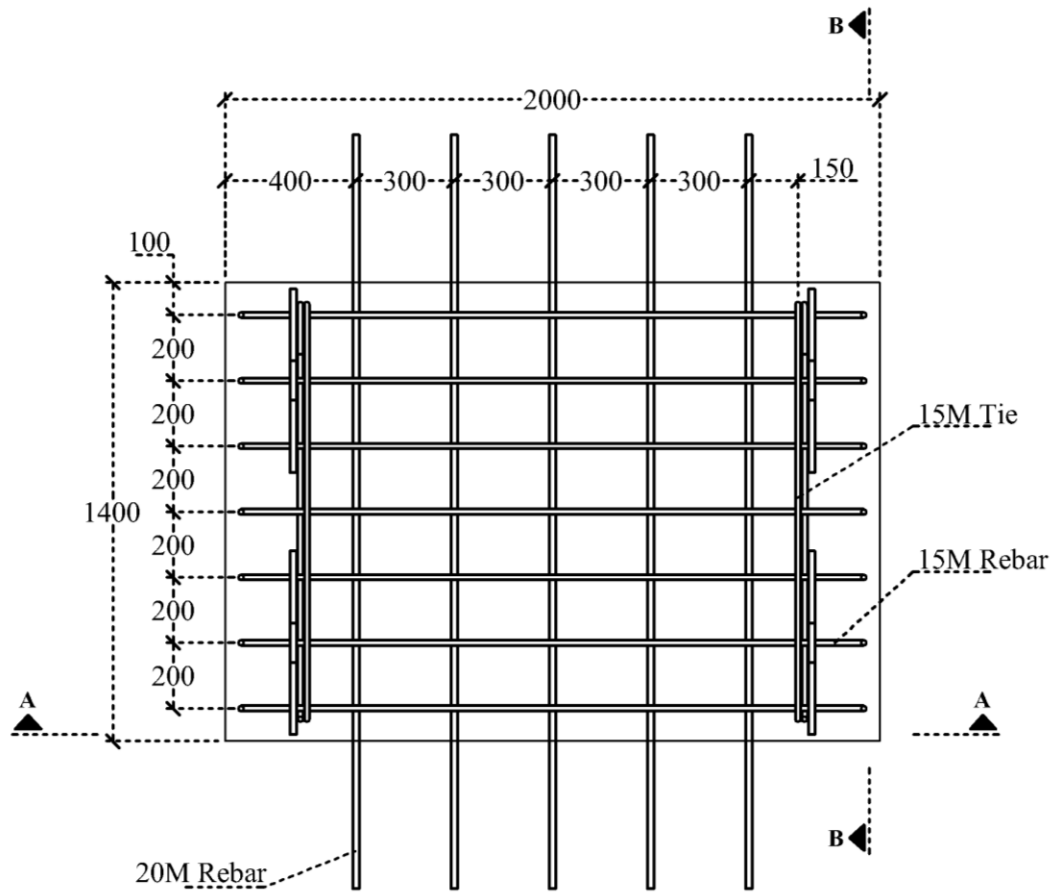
Details of reinforcing bars used in RC distributing beam
